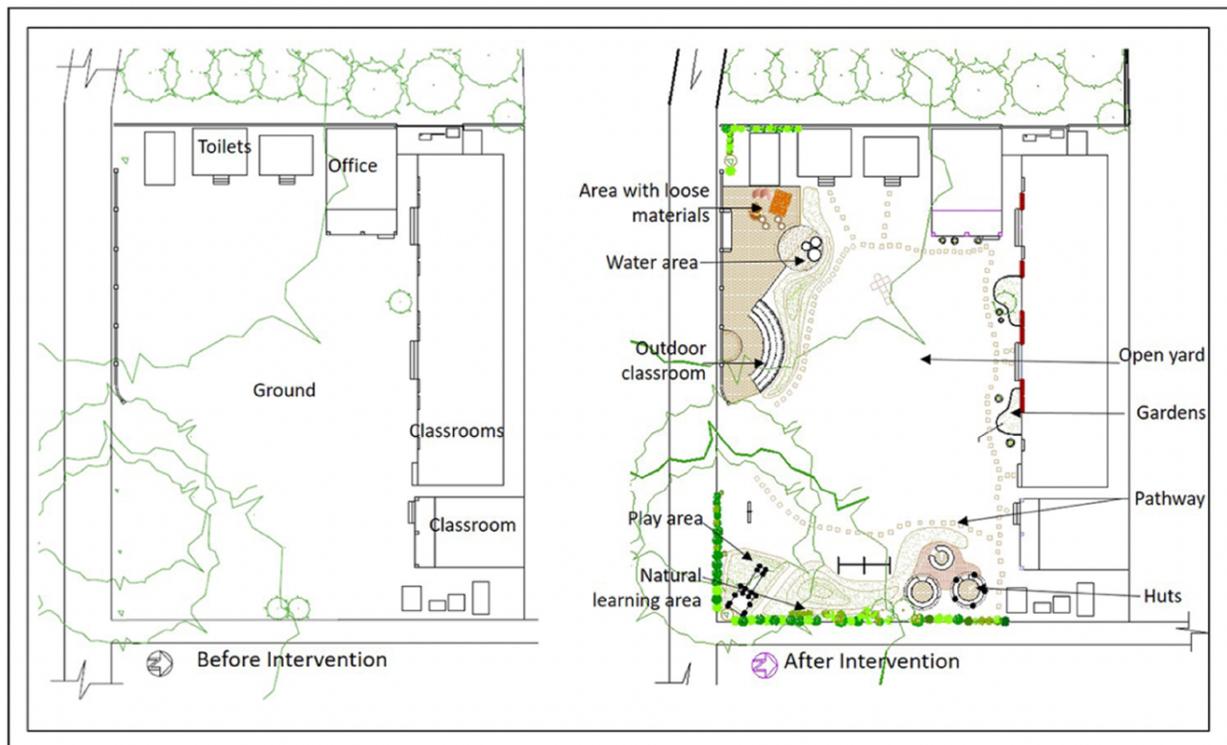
Bangladesh school grounds' biophilic design intervention (Khan et al., 2020)
